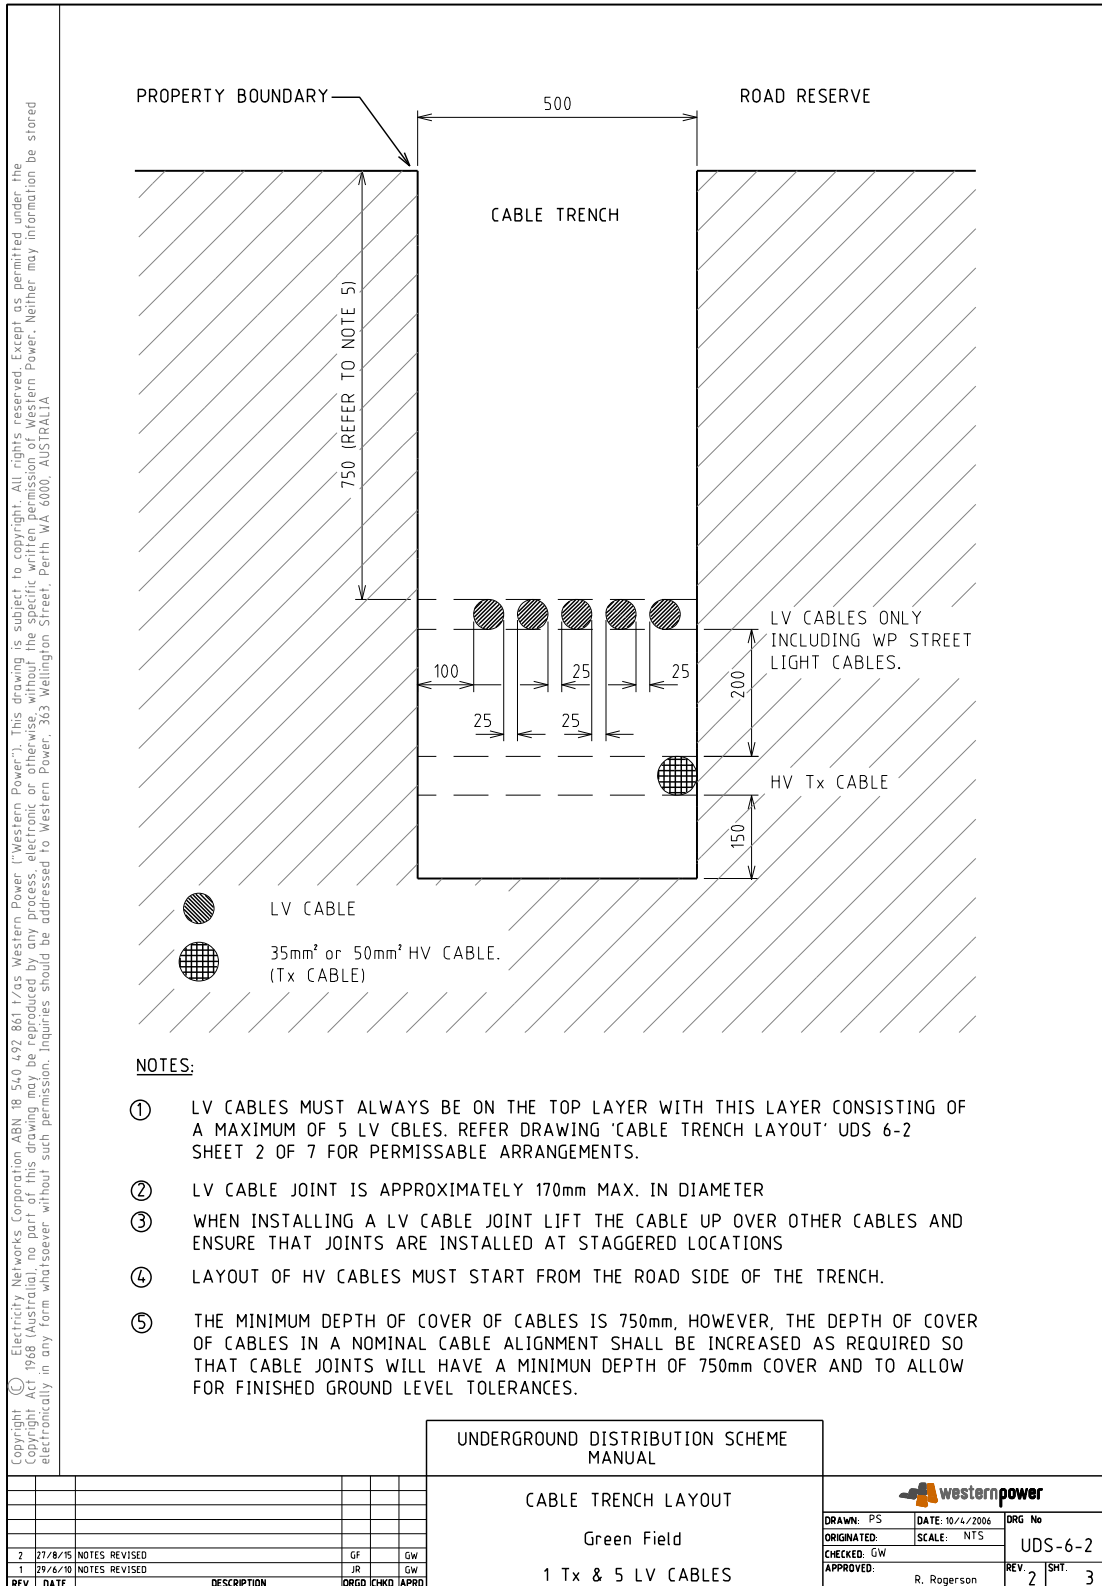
Cable Trench Layout (Sheet 3 of 7)
